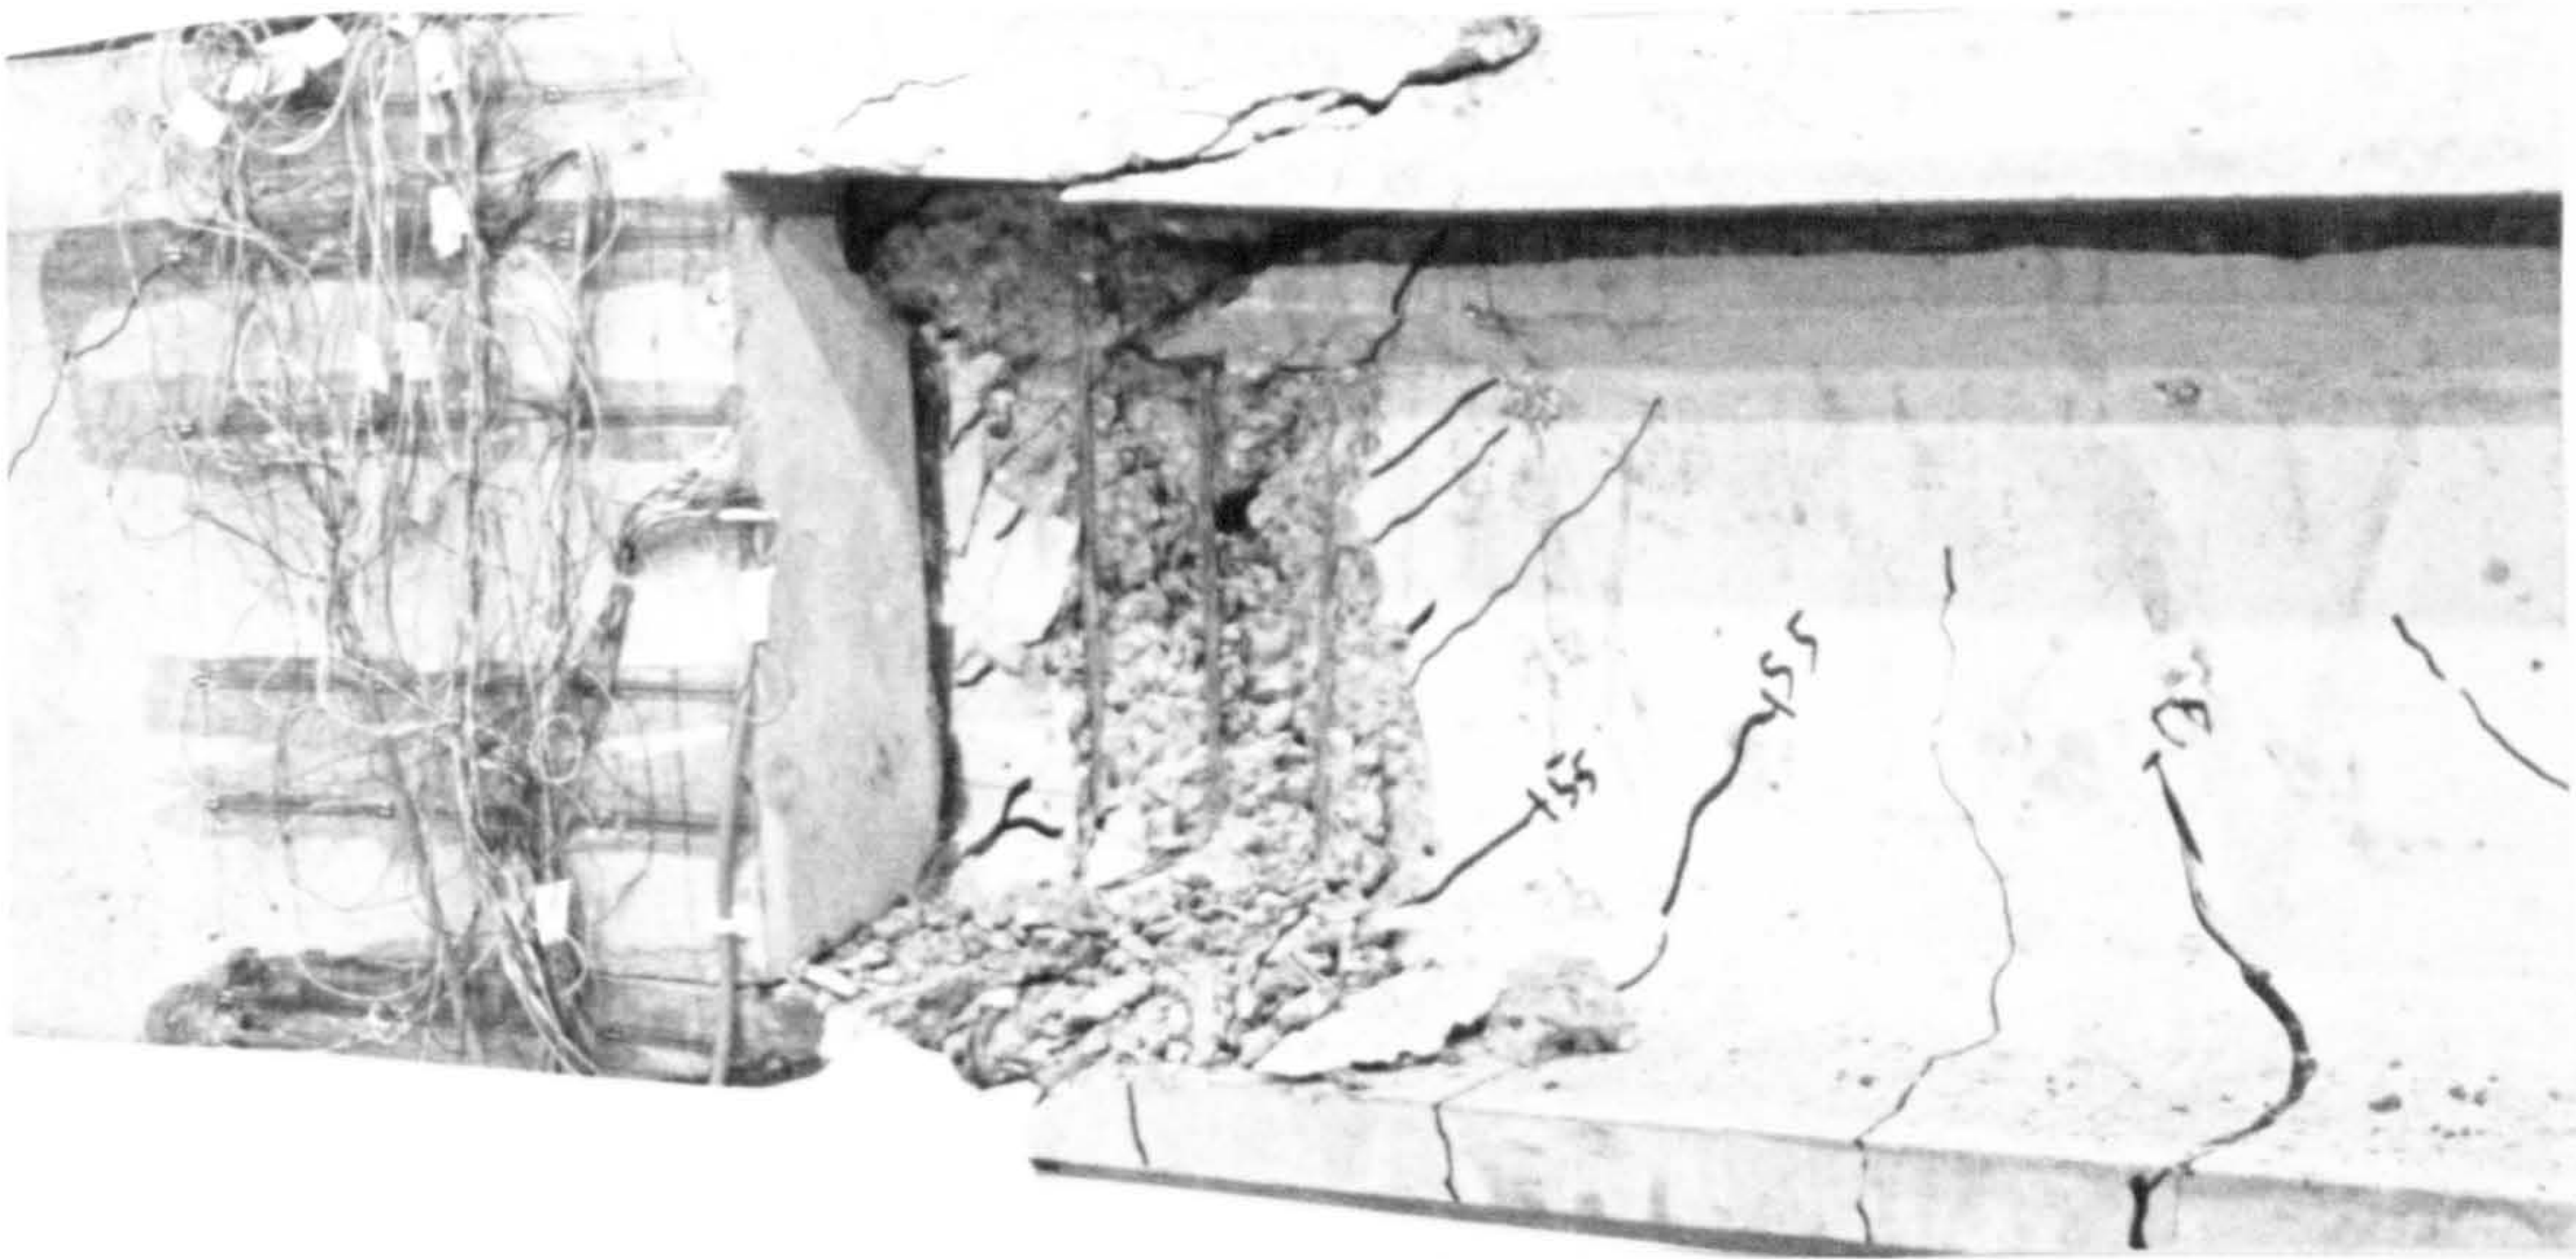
Test Similar to Prototype ( With Nib Stirrups & All Bars Projected)
